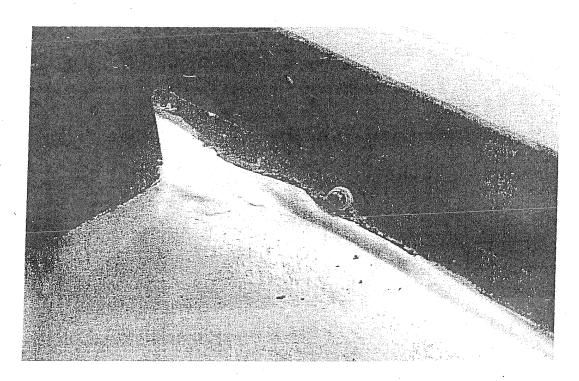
Junction Level, Northwest Corner of Walkway. A rusty flashing is shown in the northwest corner of the walkway, indicating improper drainage of water in the area.
